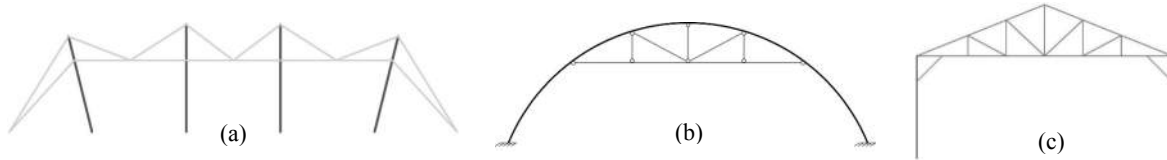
Common structural systems for nethouses: (a) tensile, (b) arched, (c) framed
